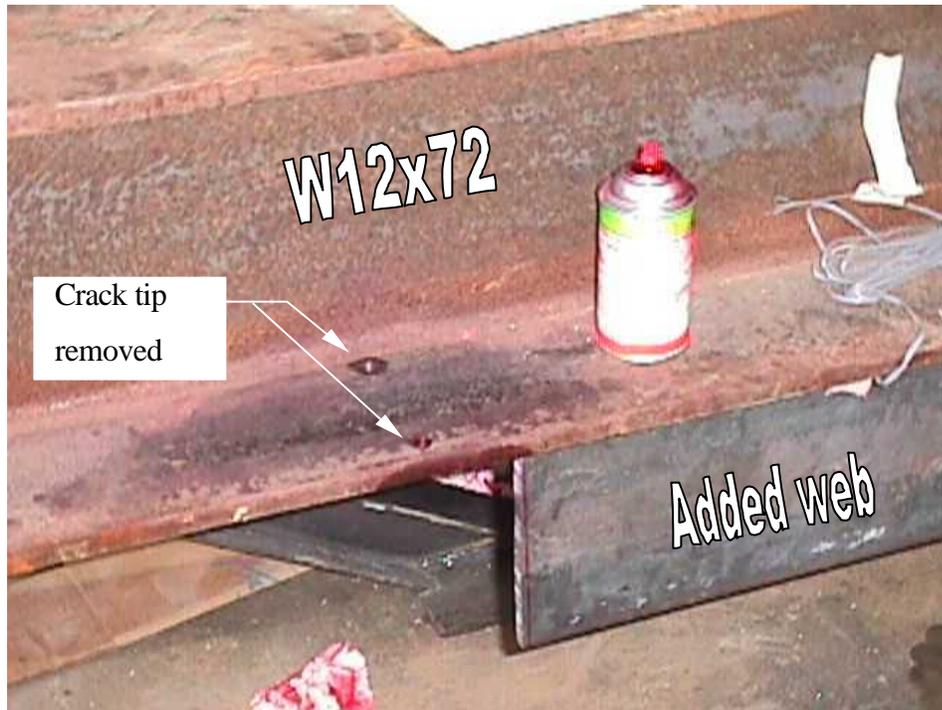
Drilled out crack tips in beam flange.
